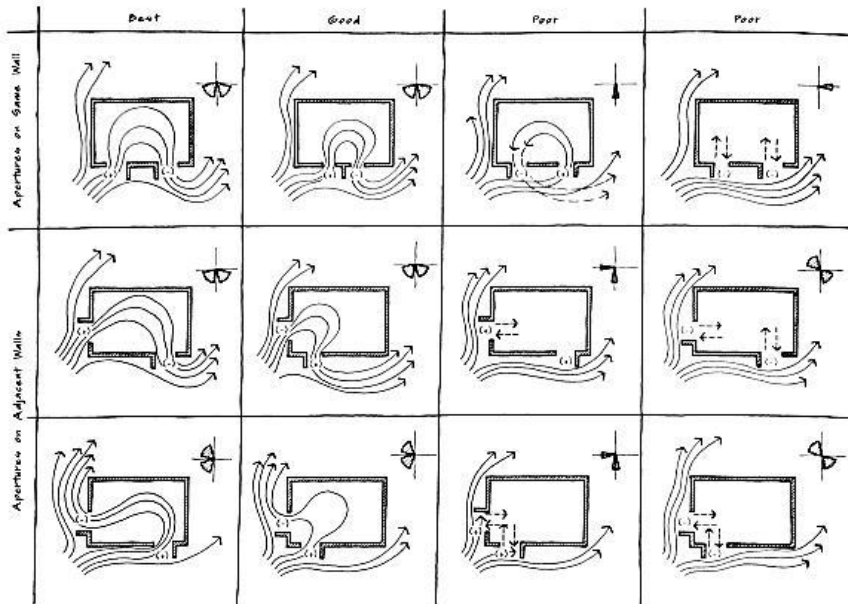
Different wing walls of better and worse effectiveness on same wall and adjacent walls
